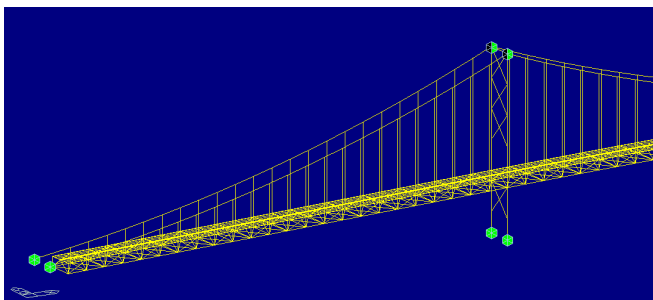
Finite element model of the proposed long-span suspension bridge with external anchorage system
